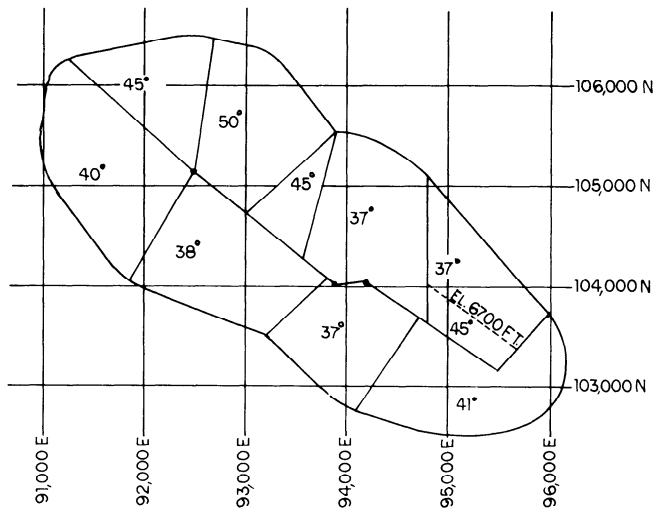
Plan view of open pit showing slope sectors (after Crawford and Davey, 1979).
